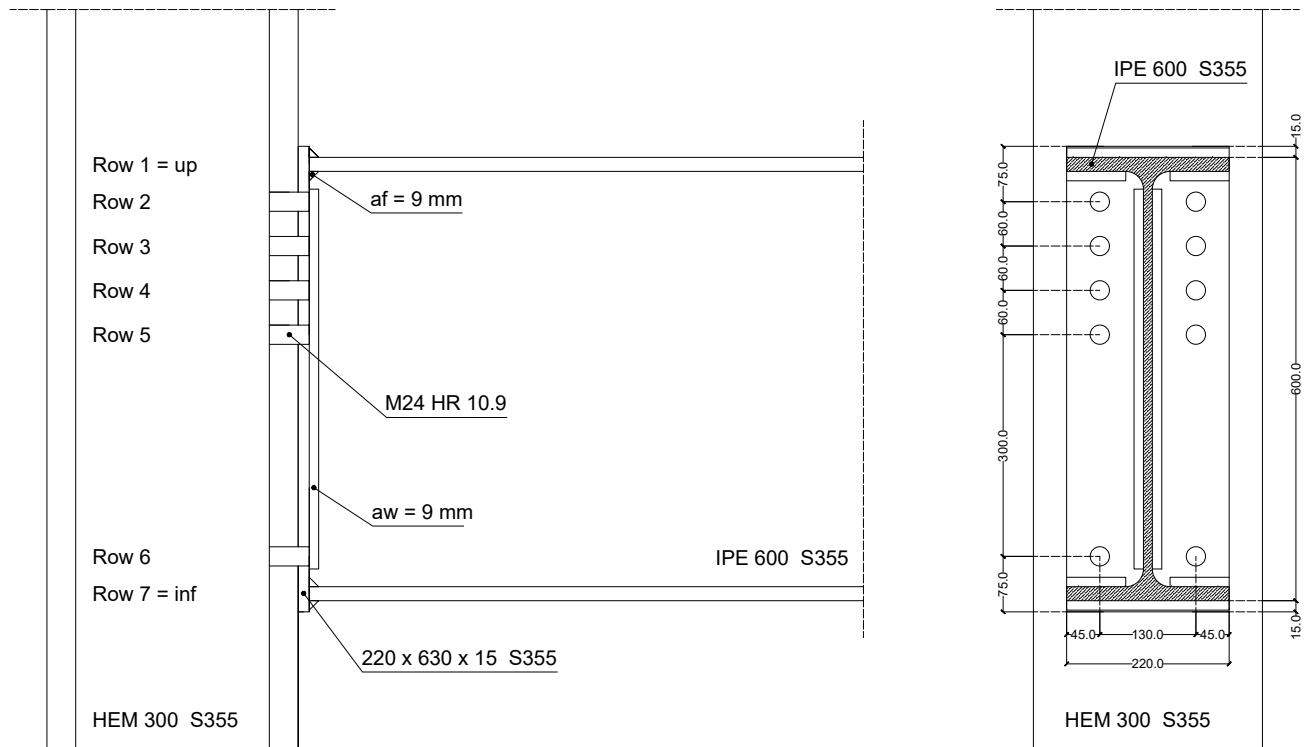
FAILNOMORE - Joint configurations C3 - Technical drawing
